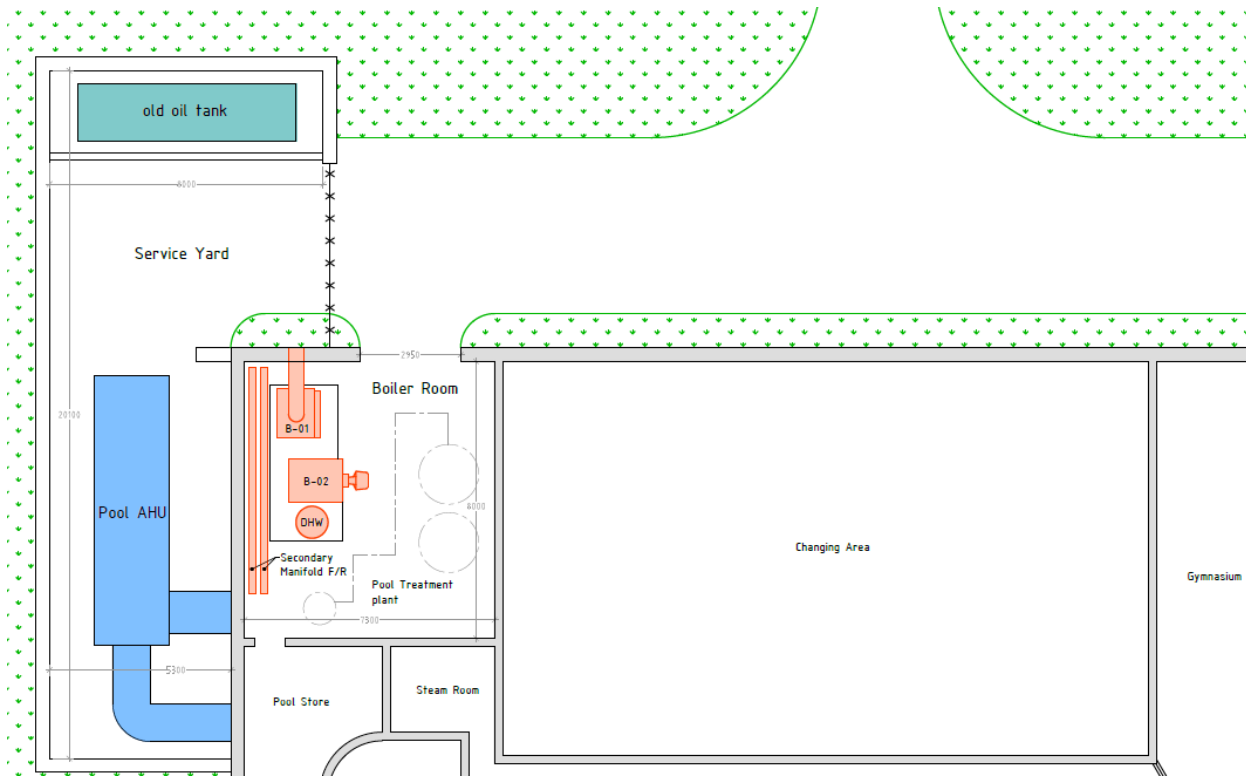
Existing Plant Room location with respect to the main SRSC building
